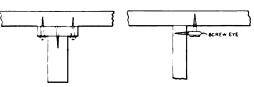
A Modification of the Fixture Shown in Fig. 32.
